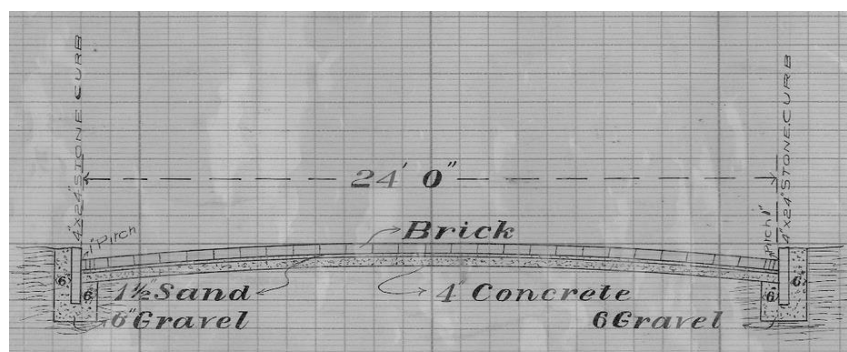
Carlton Street brick surfaced pavement designed in 1902
